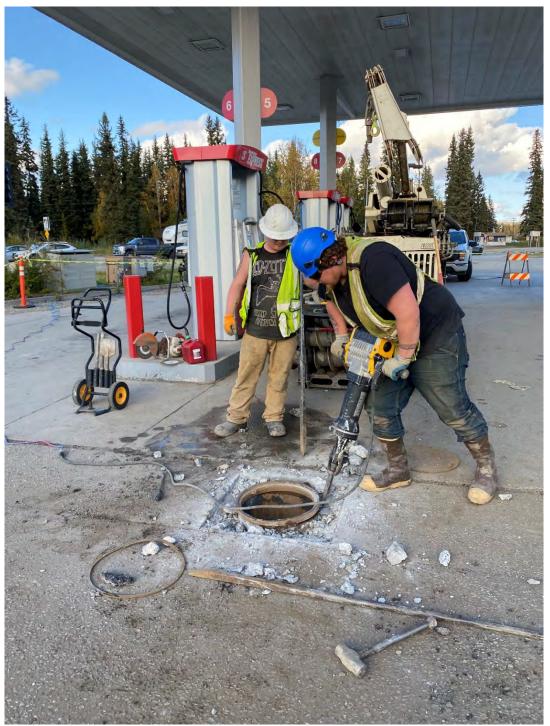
Drillers jackhammering through cement in order to make room for a larger manhole for IW-2023-D.
